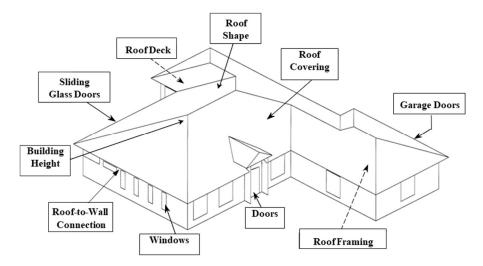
Building Envelope Features the Control Wind Damage and Loss.
